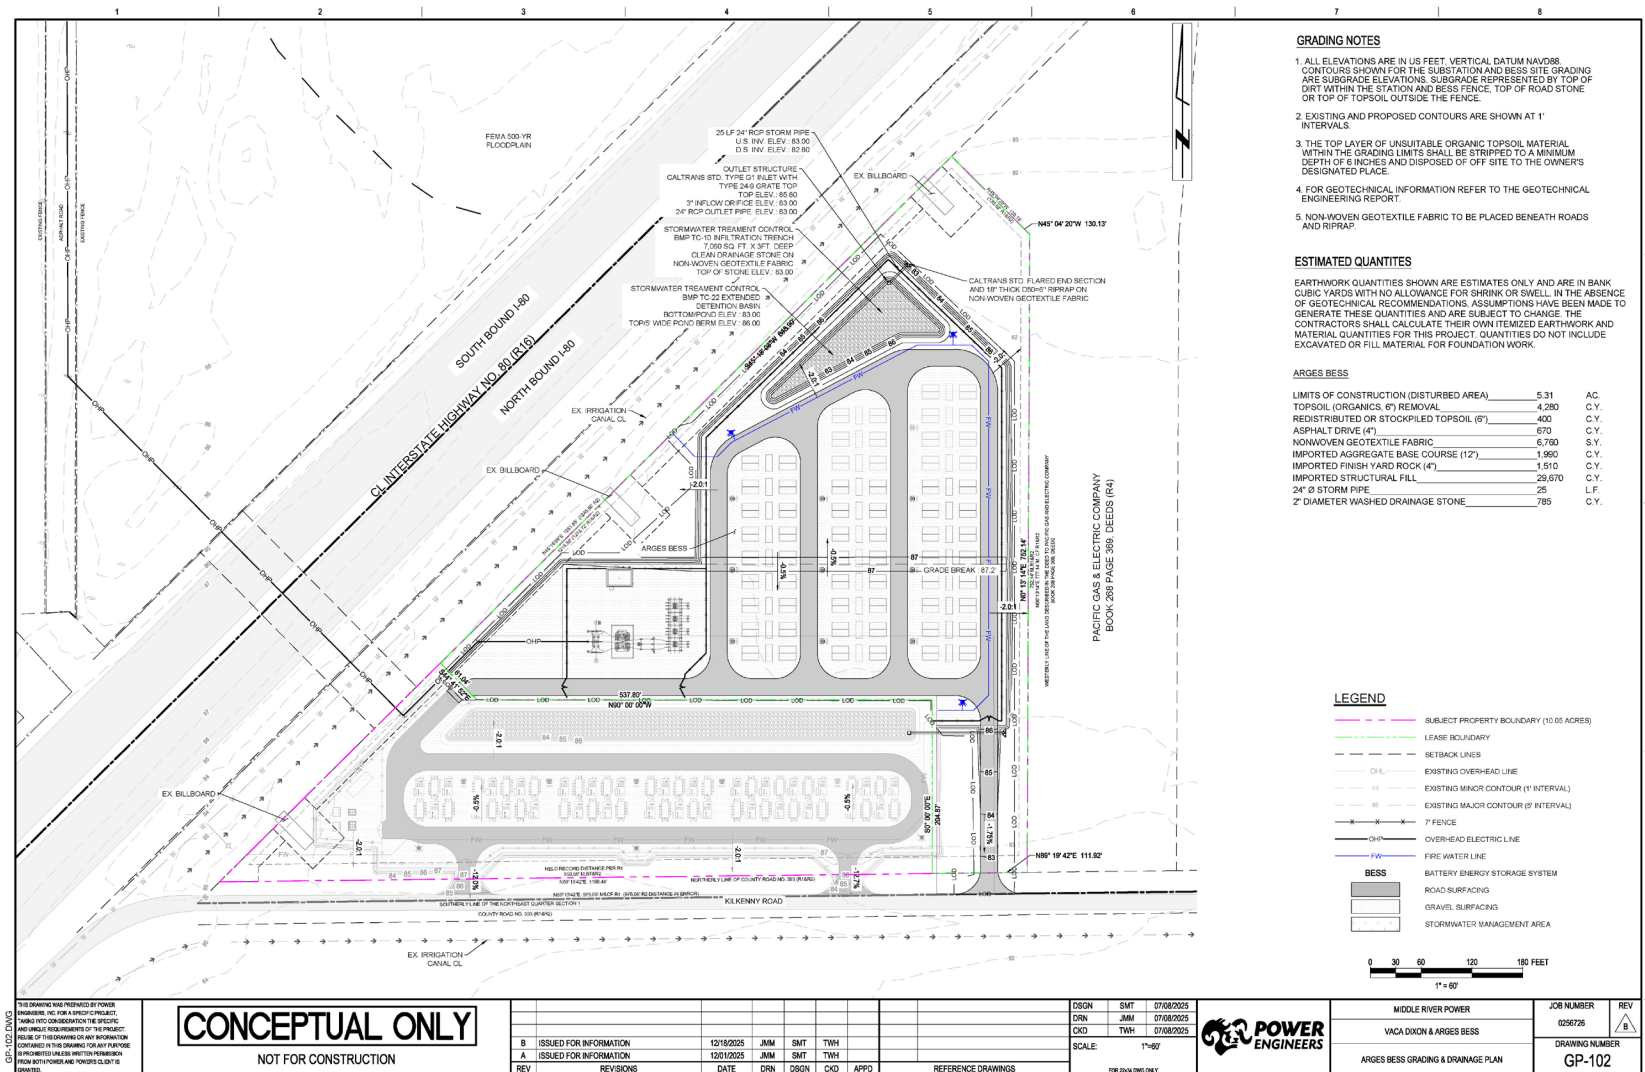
Grading and Drainage Plan – Arges 400 MWh BESS Component
